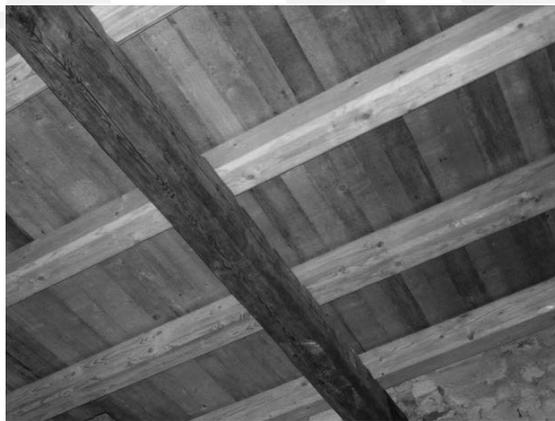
New and old (recovered) structural elements used as part of the ceilings
